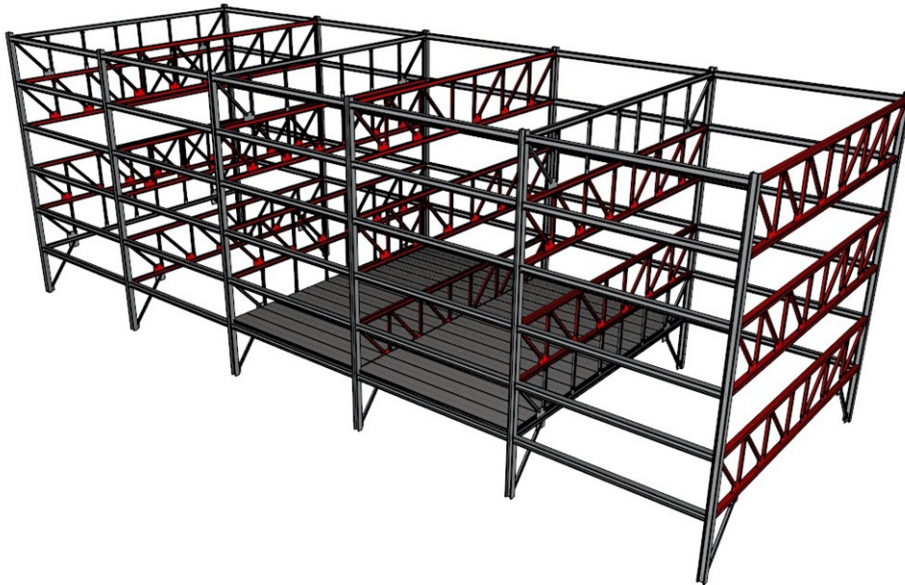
Overview of the conventional Staggered Truss Framing system (STF system).
